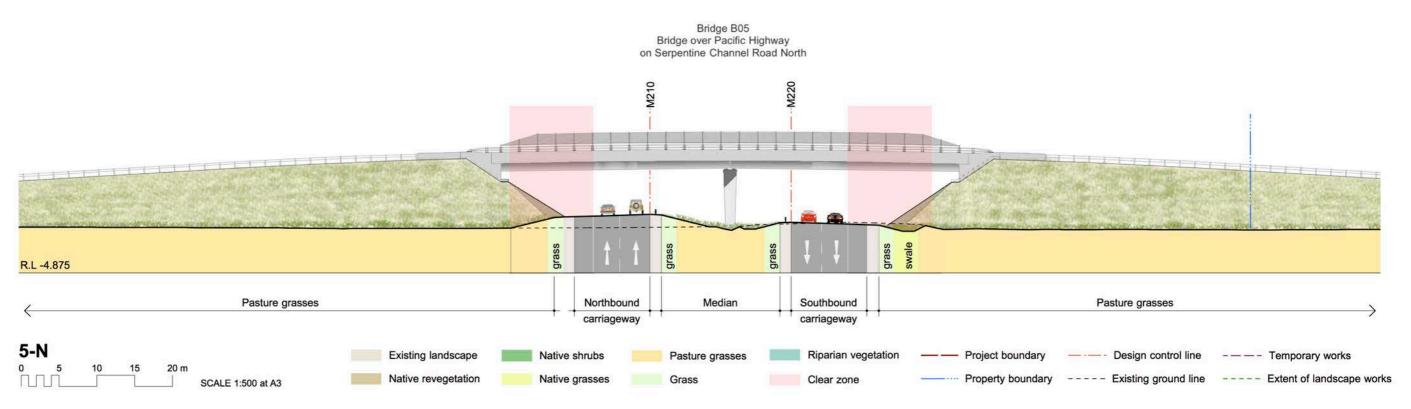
Section 5-N at Bridge B05 - Bridge over Pacific Highway at Serpentine Channel Road North
